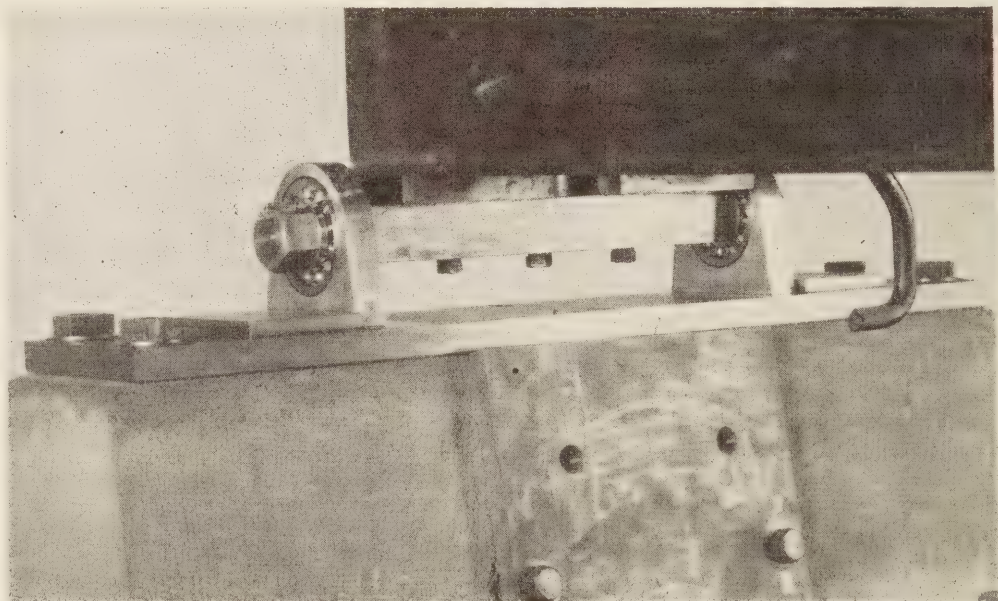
Sliding end bearings substituted for wheel bearings, mounted on the H-section.
